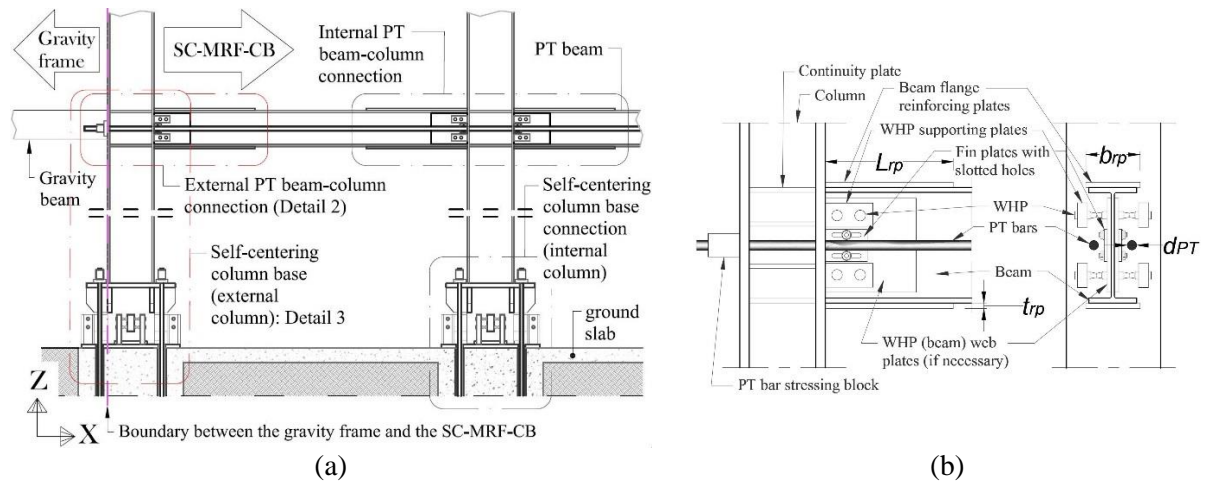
Close-up view of: (a) the bottom-left part of the SC-MRF-CB in Elevation A of the prototype building (Detail 1 in Figure 1(b)); and (b) PT beam-column connection at an external column with its notation (Detail 2 in Figure 2(a)).
